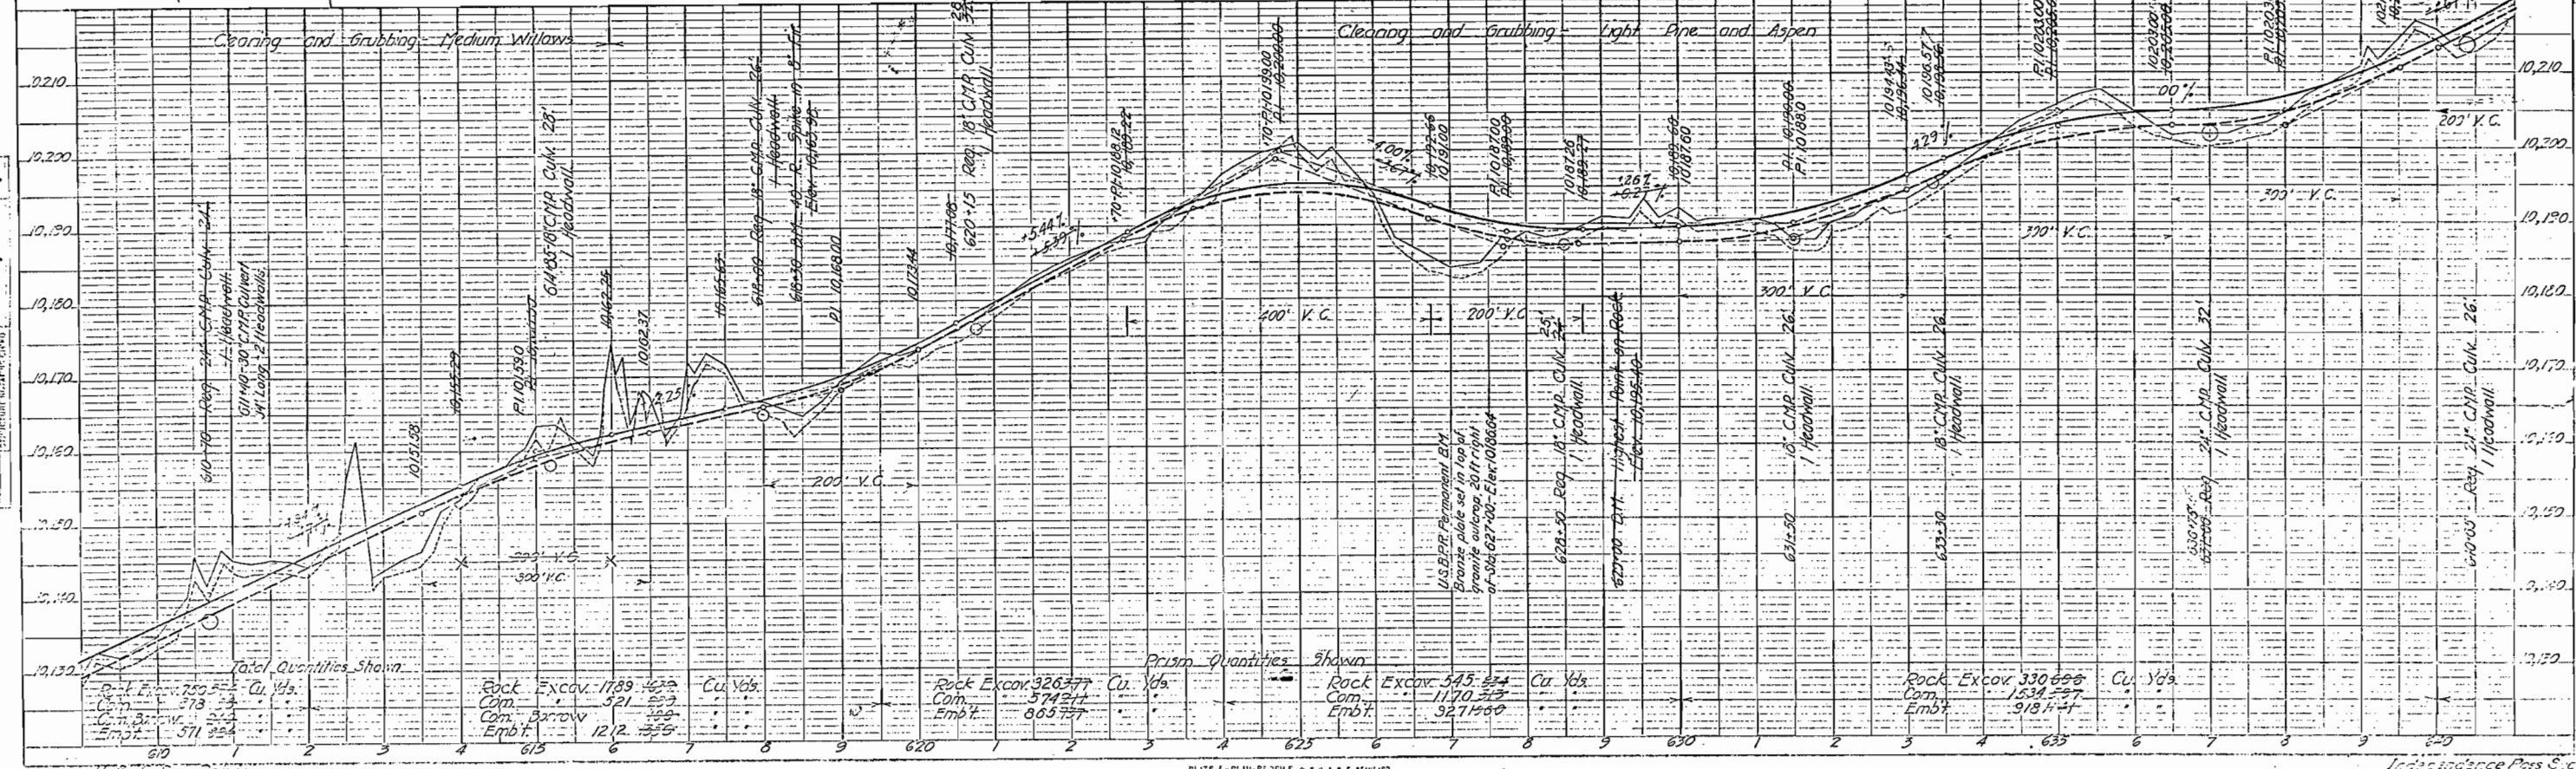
PLAN-PROFILE O. P. R. & R. E. STANBRO
